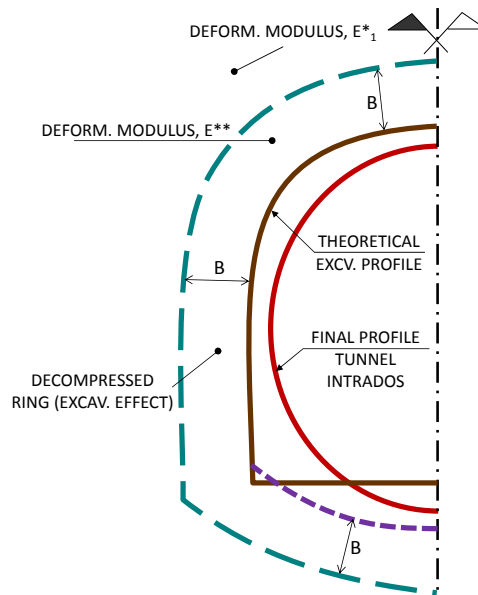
2D Schematic model of rock deformation around hydraulic tunnels
